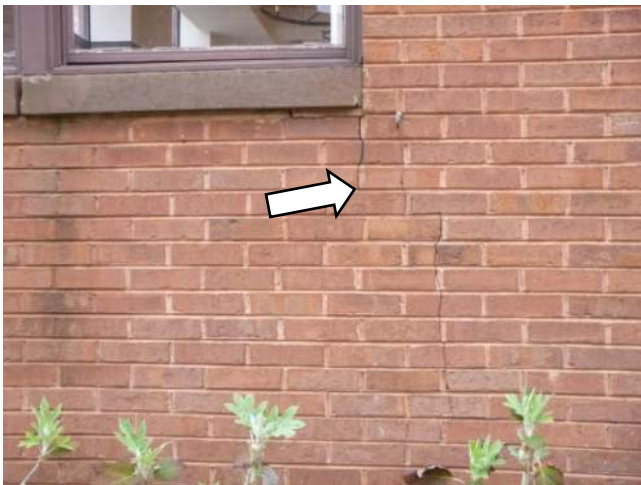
View of a crack in the brick masonry facade extending from a window corner.
